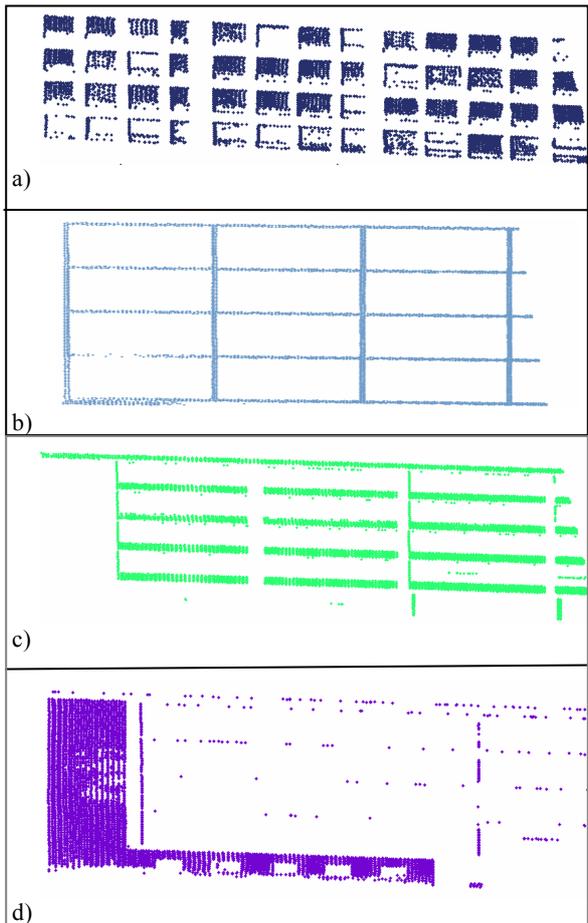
Four planes displayed separately; a) windows; b) beams; c) balconies; d) principal wall.
